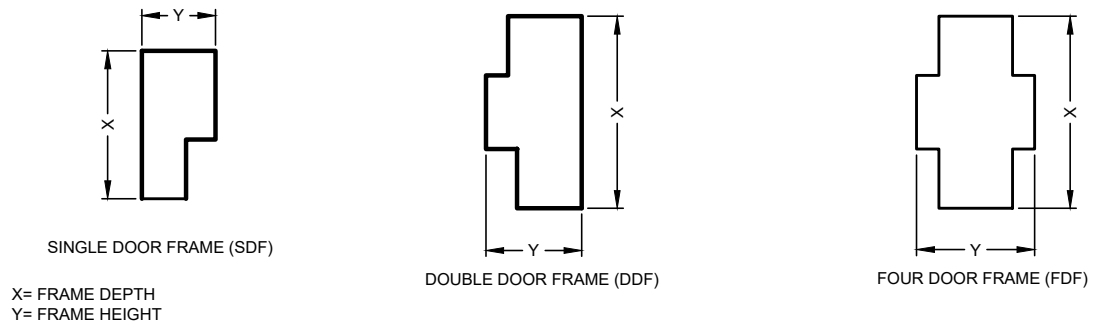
EXAMPLES OF TUBULAR STEEL DOOR FRAMES PROFILES
